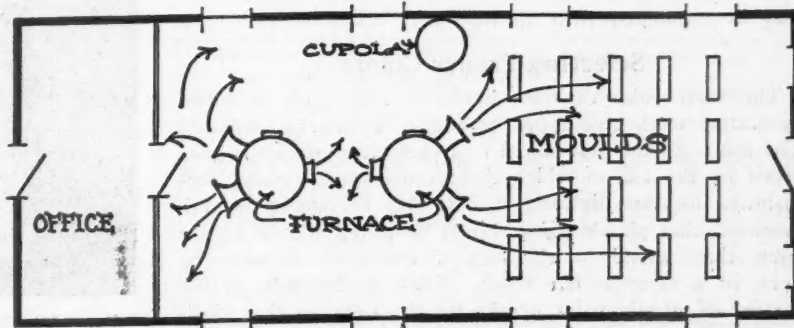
Plan of a Foundry Heated with Warm Air Furnace Units.
